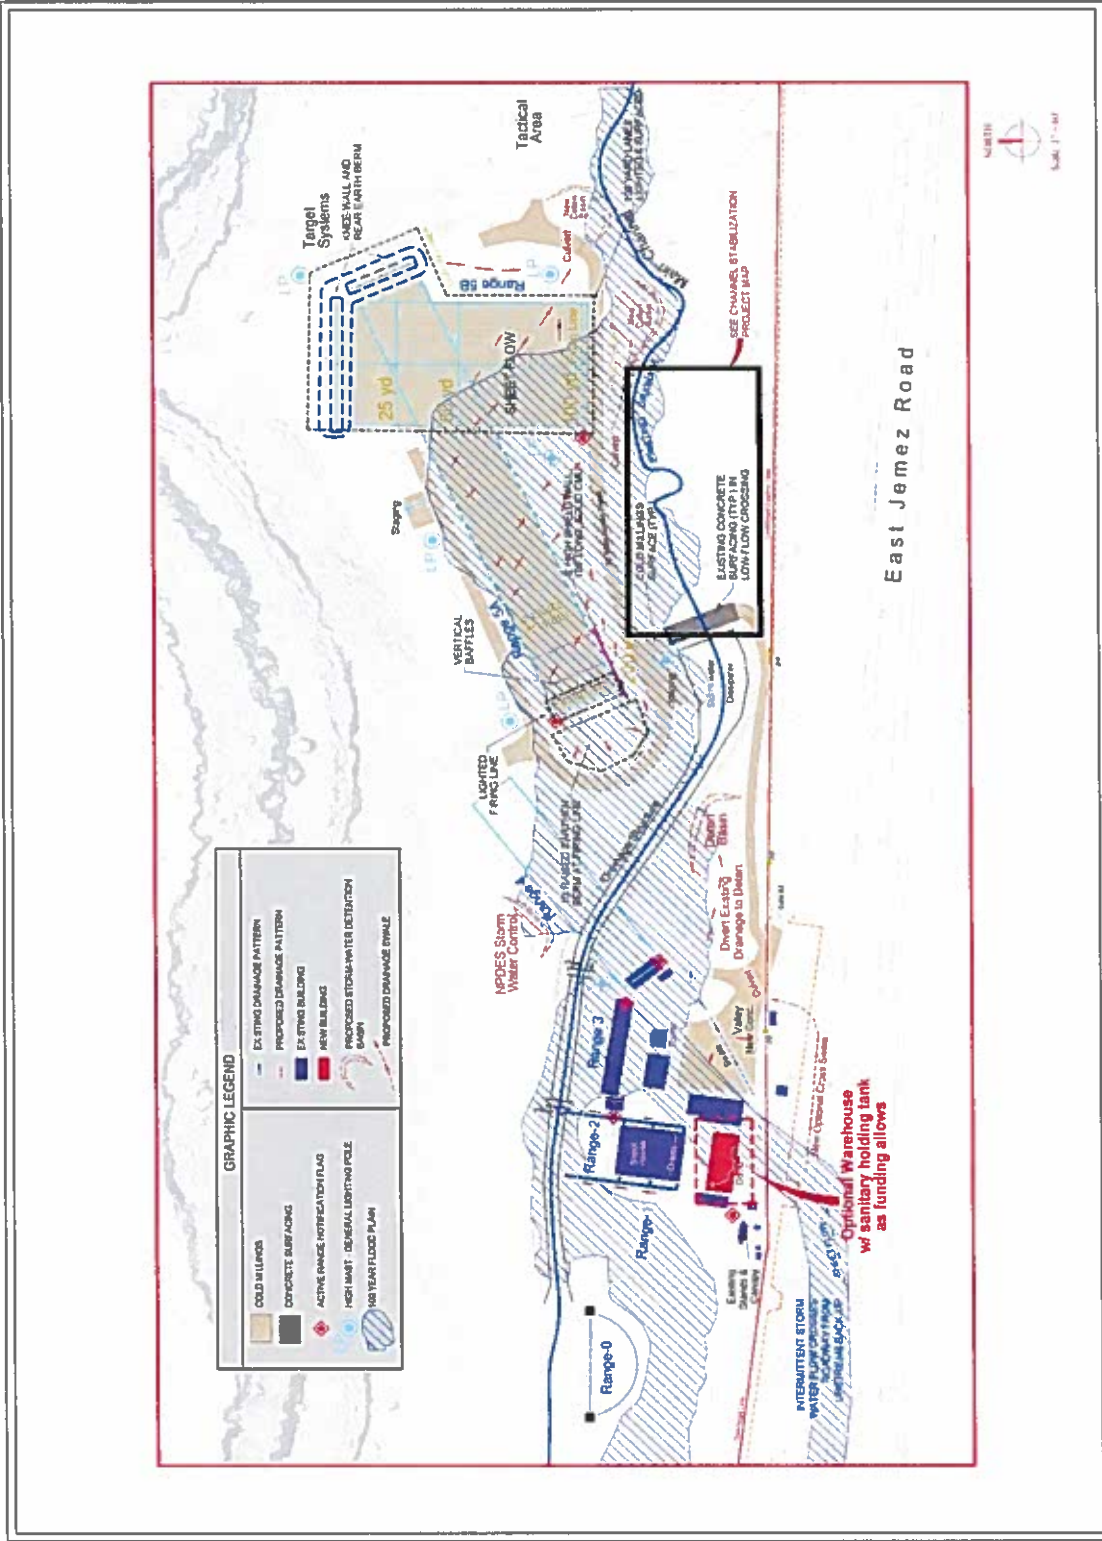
TA-72 Proposed Site Drainage Plan in relation to the 100-yr floodplain.
